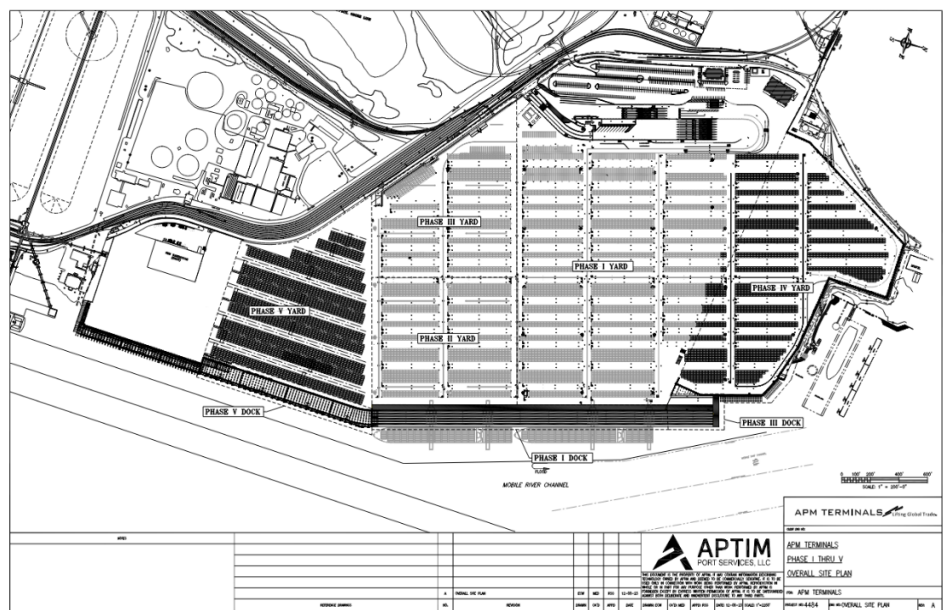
APM Terminal Overall Site Plan Phase 1 Through 5
